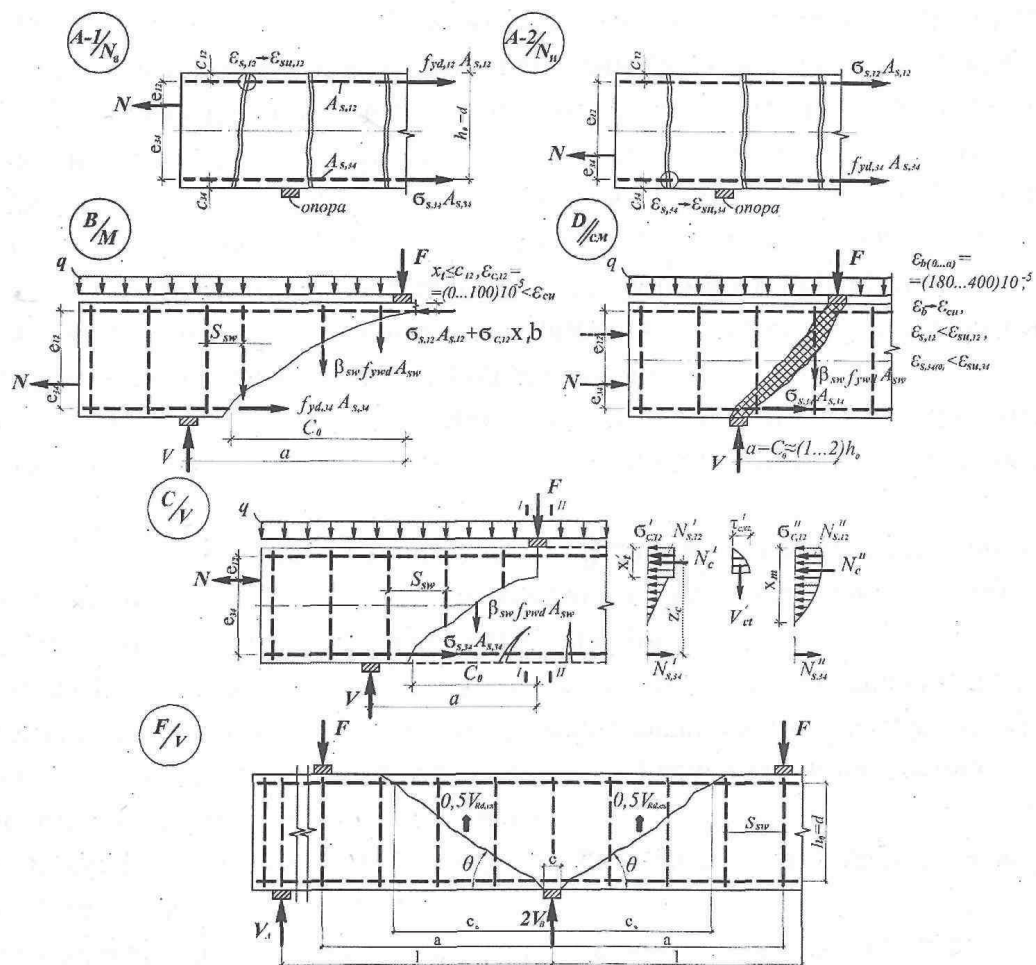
Main destruction patterns of single eccentrically tensioned and compressed common and pre-stressed reinforced beams
